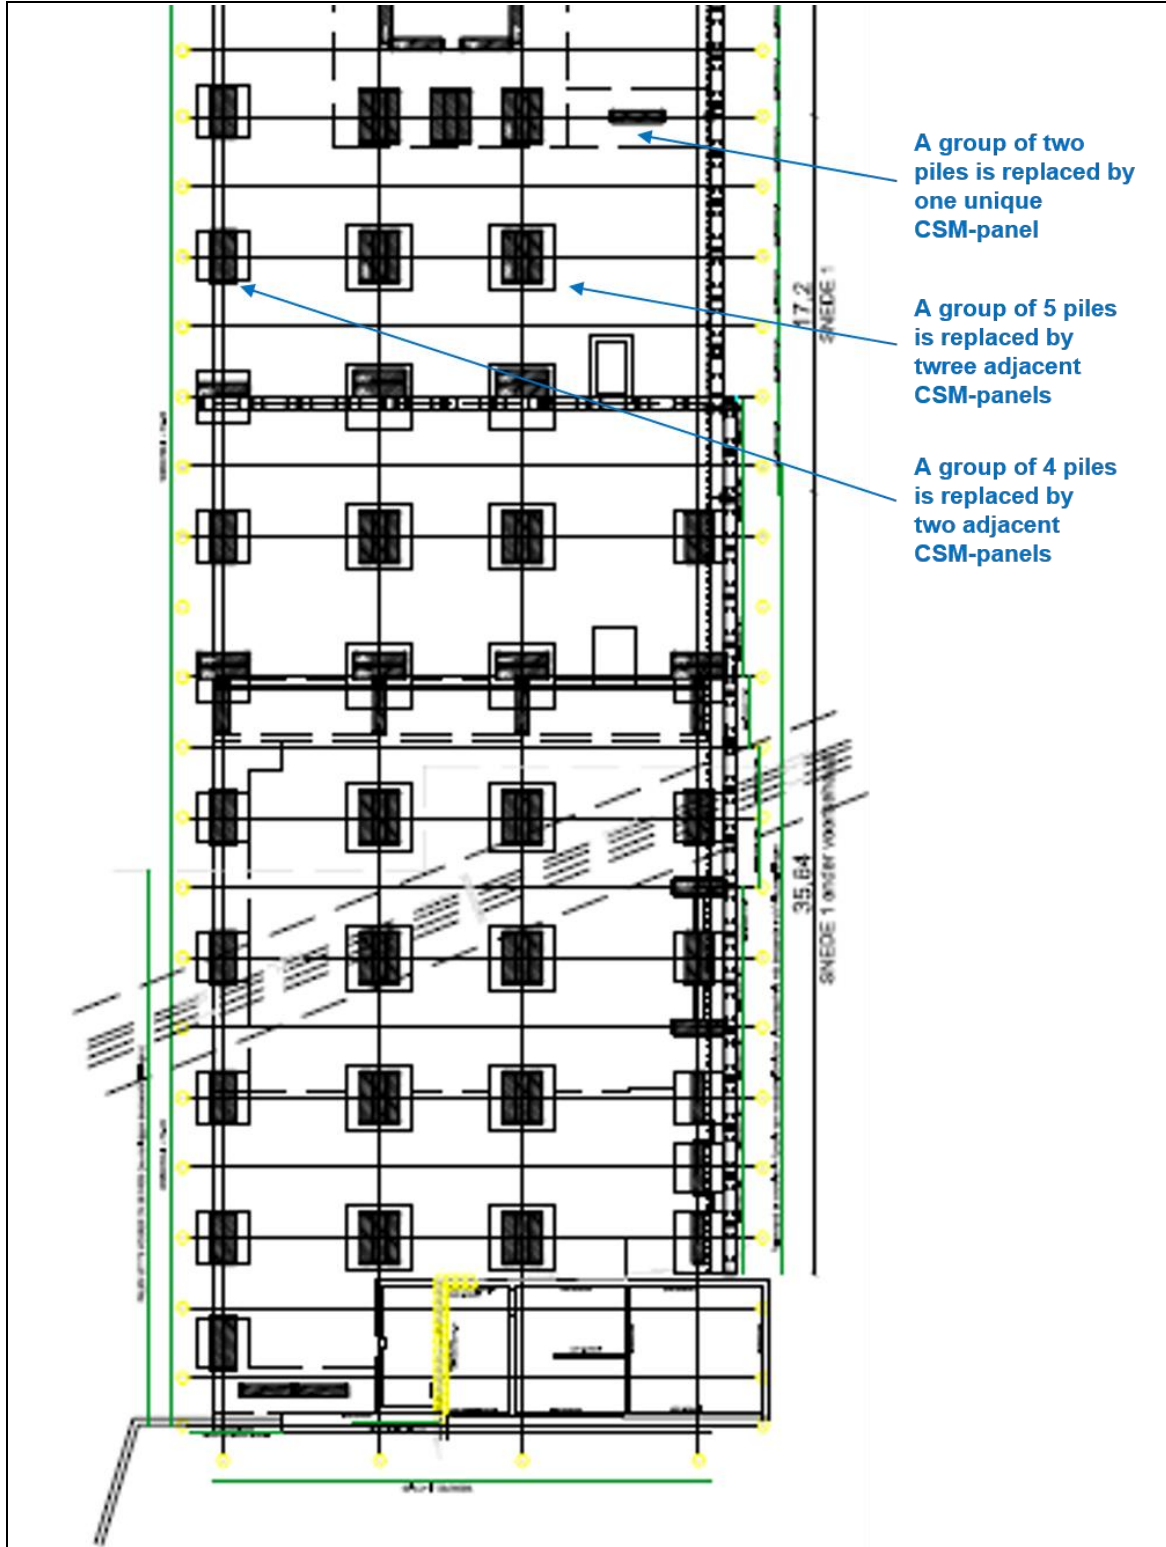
Schematic view of a part of the new foundation plan of the REGA-Instituut with the different soil mix panels (CSM-panels) supporting the pillars of the building frame and the connection tunnel
